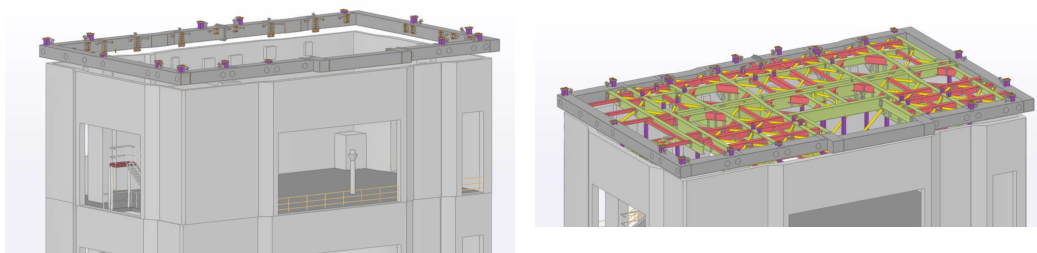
Erection: Perimetric beam (left), Superstructure up to perimetric beam (right).
